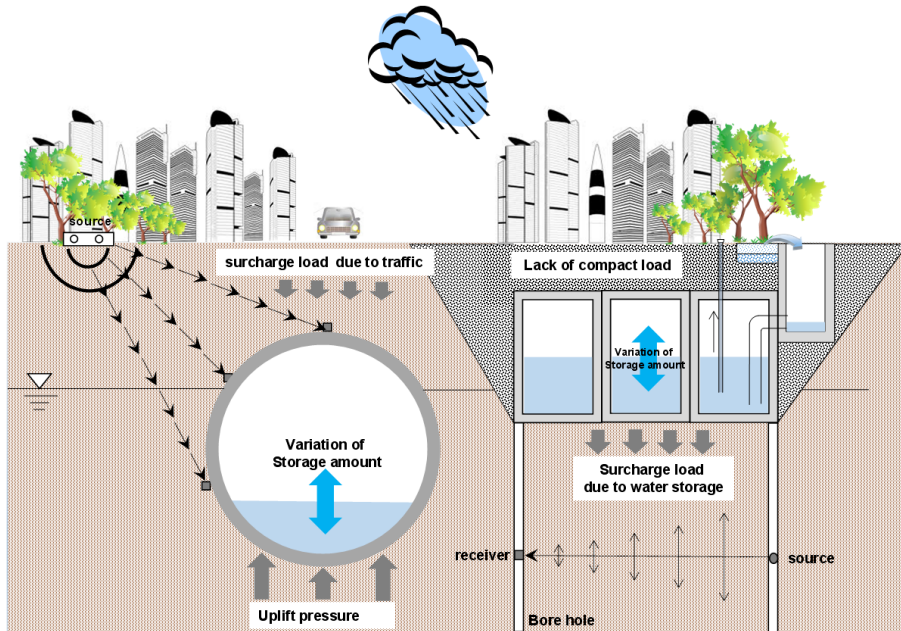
Schematic diagram of geotechnical issues according to the construction of an underground rainfall storage facility in an urban area
